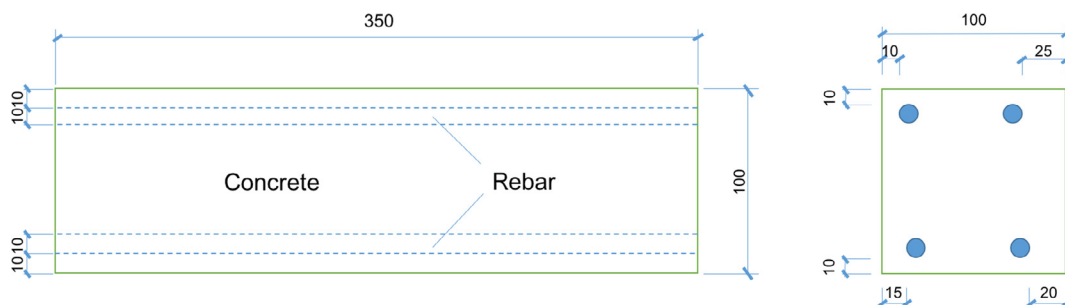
Configuration of specimens and the layouts of the rebars (unit: mm).
